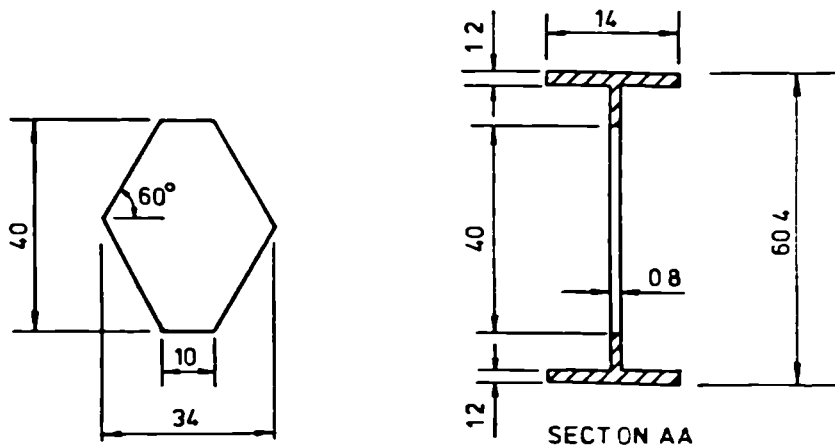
b. DIMENSIONS OF HOLE AND CROSS-SECTION (mm)
